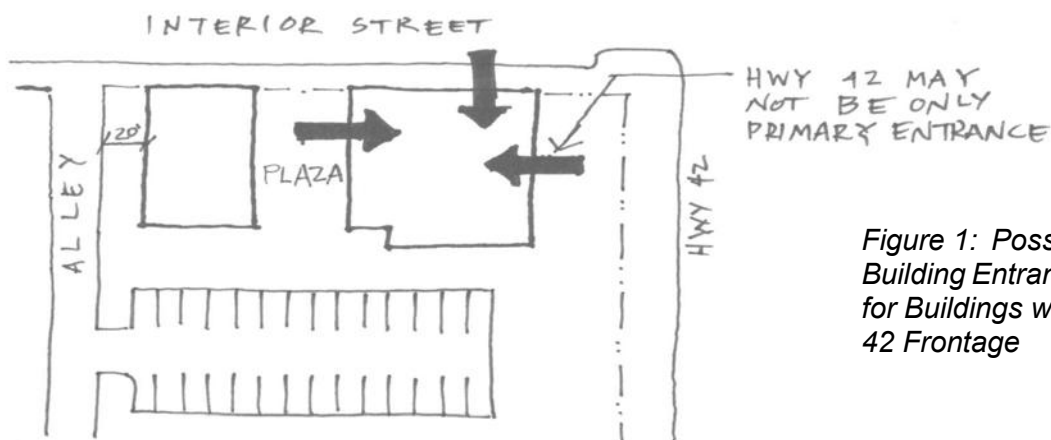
Possible Primary Building Entrance Locations for Buildings with Highway 42 Frontage
